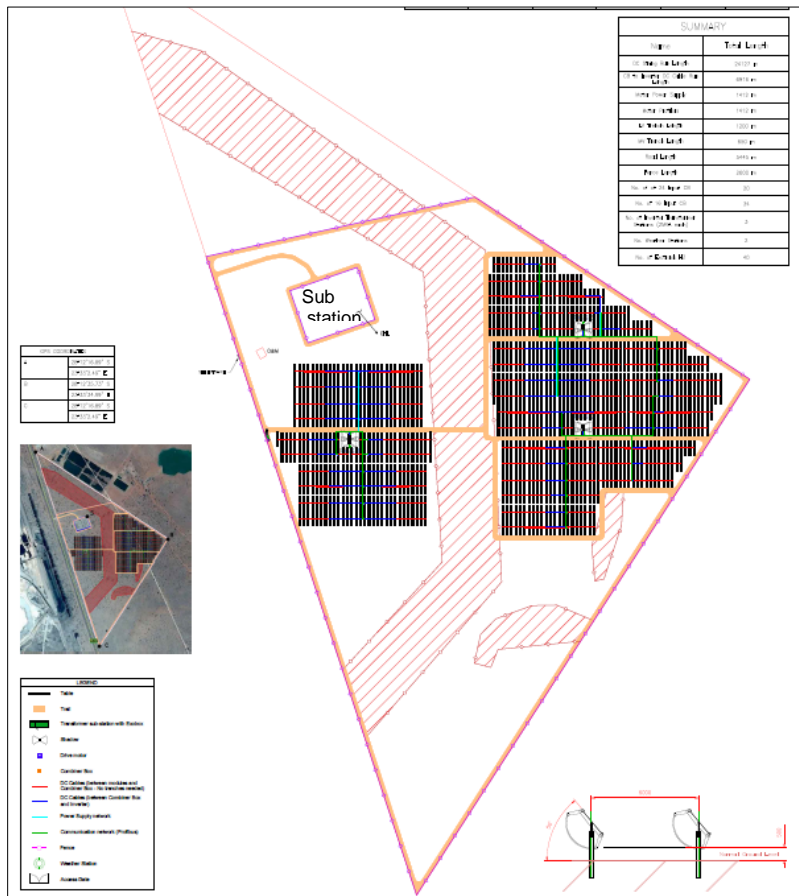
Danielskuil Solar Energy Farm: proposed layout plan
